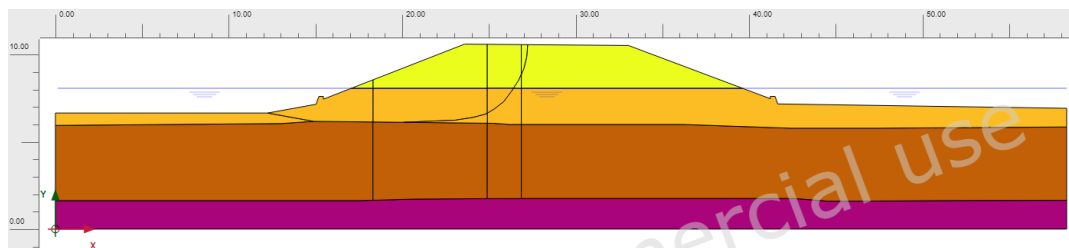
Initial cross-section used in linear elastic modeling of Hachiro-Gata Road Embankment
